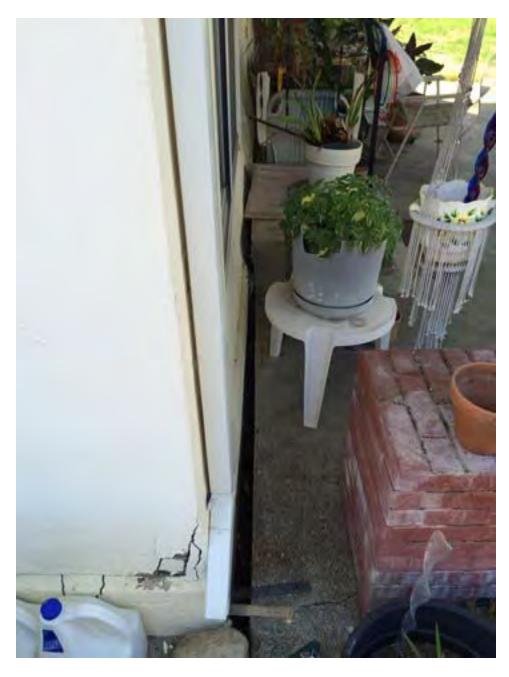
Displacement of patio slab relative to structure foundation; cracking of corner [NSF-GEER; N 38.3041 W 122.3429; 08/25/14 13:18]
